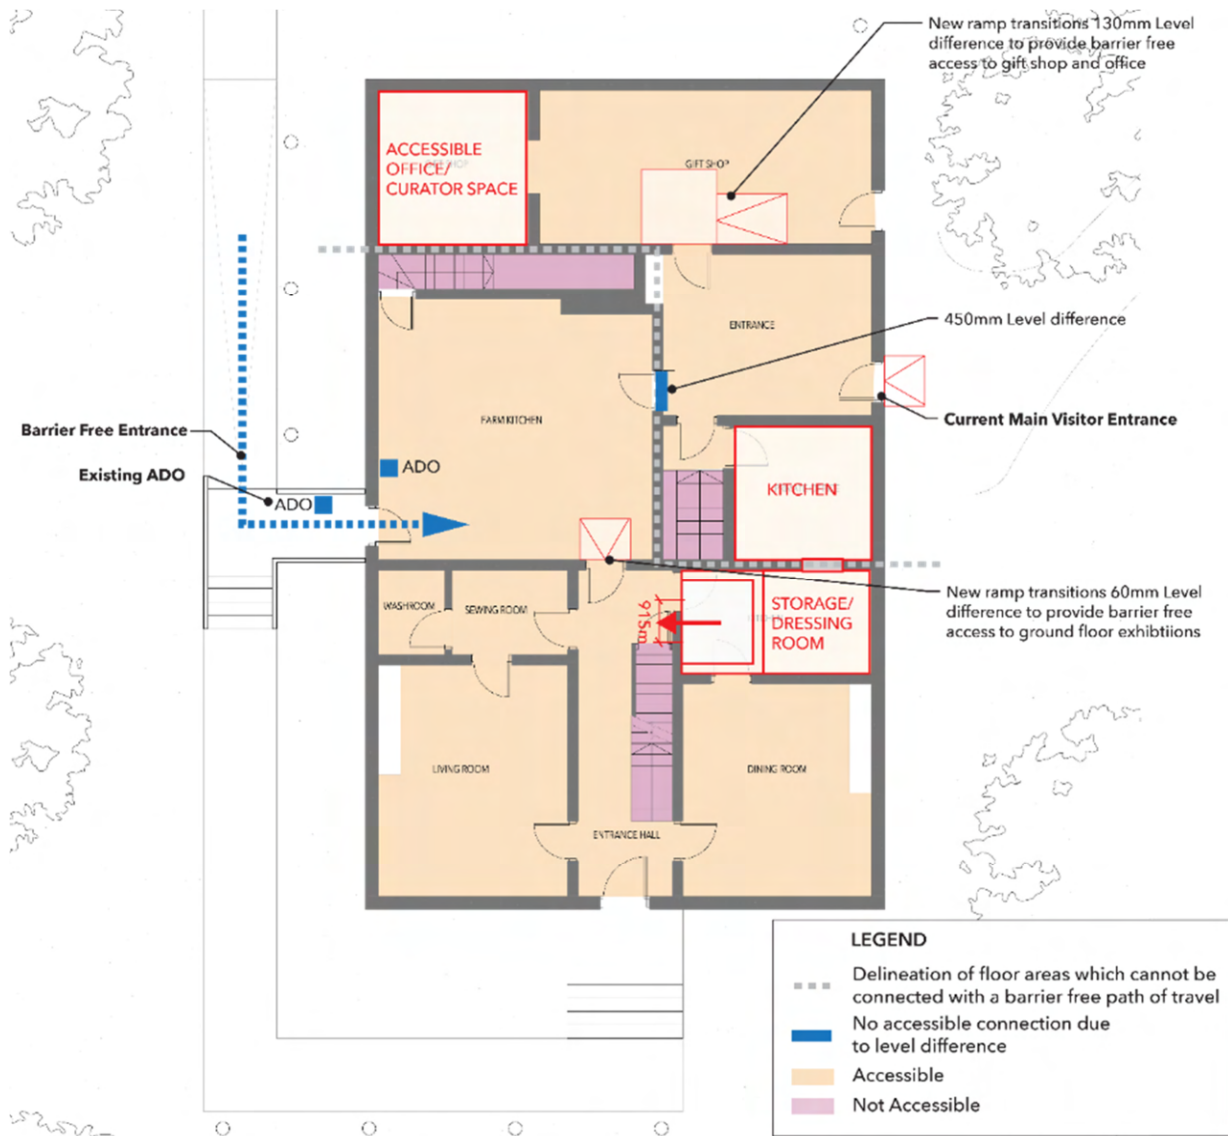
Main House - Ground Floor Proposed Accessibility (Option 1)
